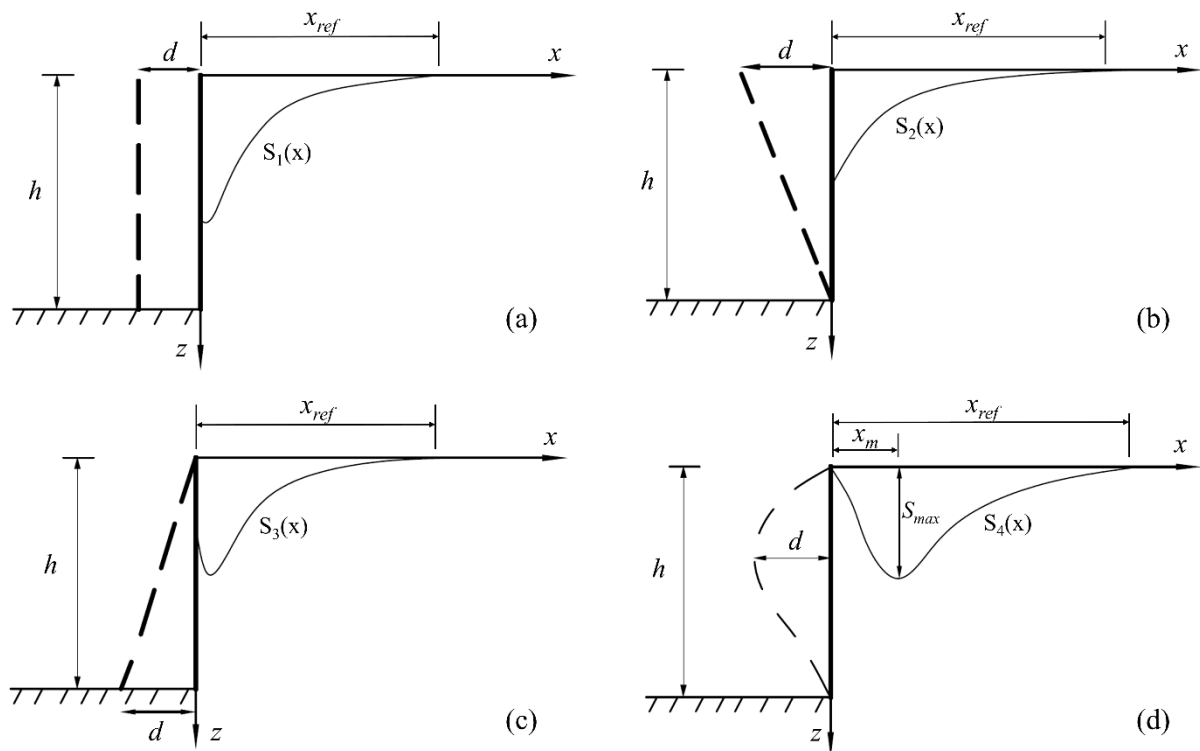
Typical surface settlement modes under different types of retaining-wall deformation: (a) translation mode; (b) rotation around the wall base mode; (c) rotation around the wall top mode; (d) flexible parabola deformation mode.
